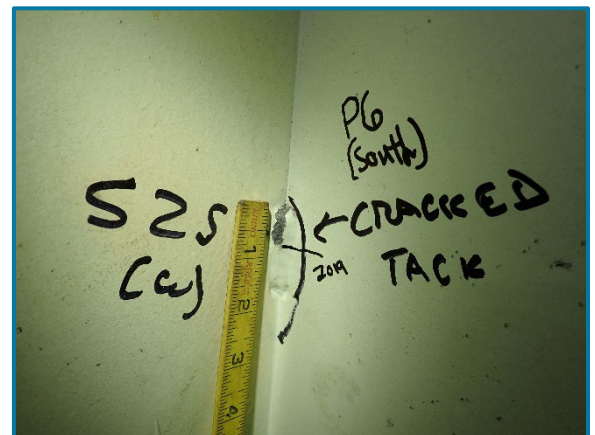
Cracked tack weld at the second intermediate stiffener between the south web near midheight (looking southeast).
